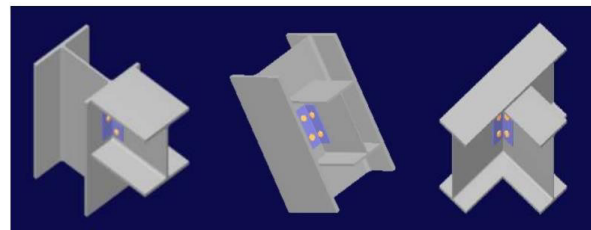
3D model of Beam-Column-Flange, Beam-Column Web & Beam-Girder Connections.
